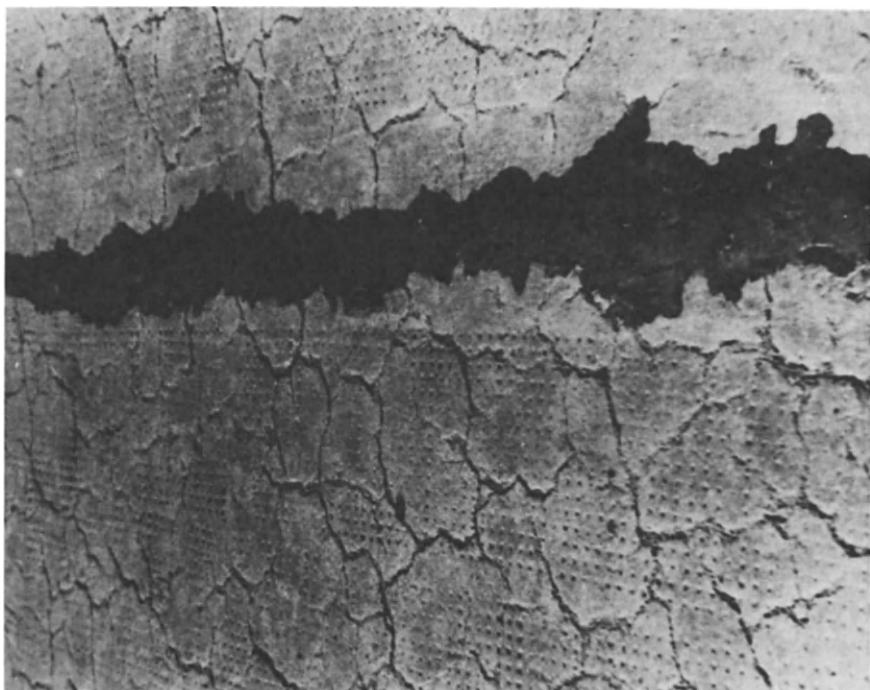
Deterioration in concrete sidewalk with extrusion of joint filler.
